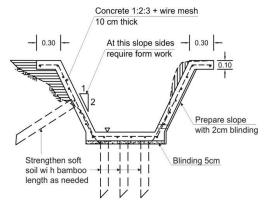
Standard detail of MRC canal (Le standard en détail de canal du MRC)
